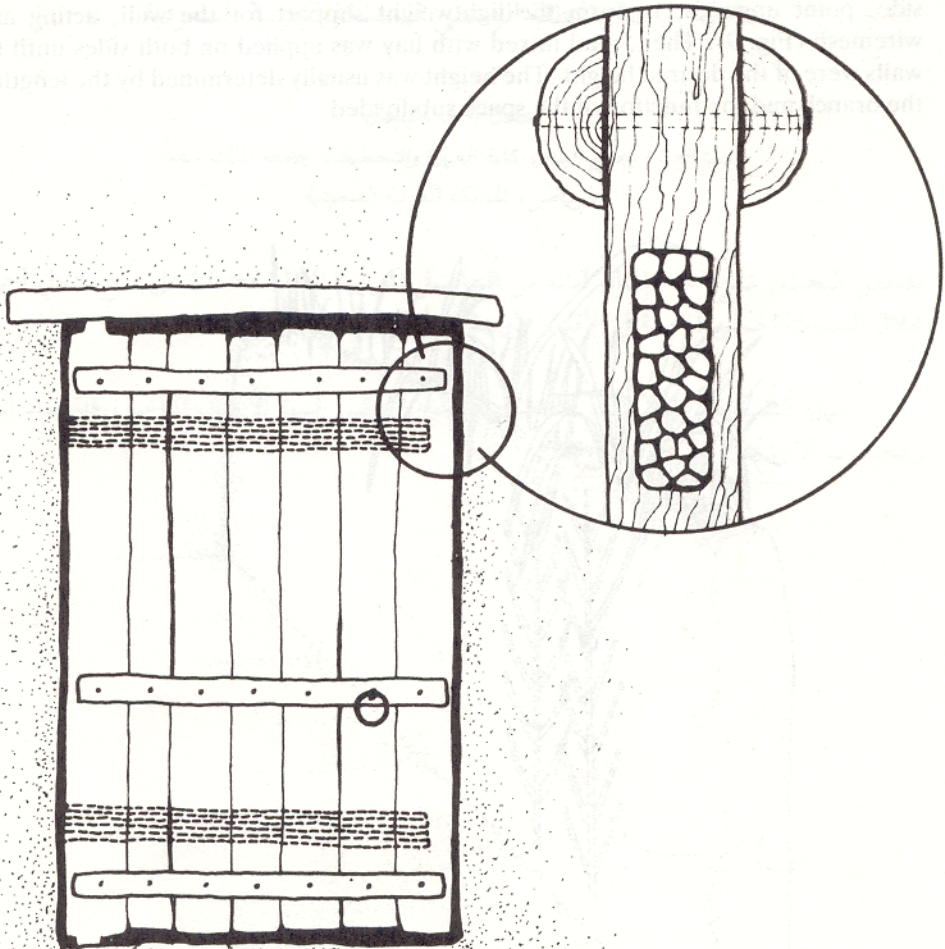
The two horizontal bands of twigs were used instead of the diagonal bracing
